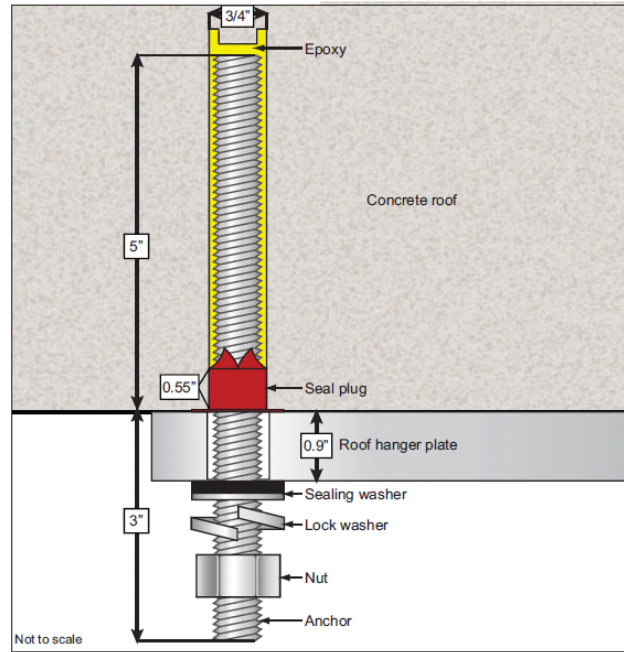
Structure of typical adhesive anchor (the ceiling not in picture) [11]
